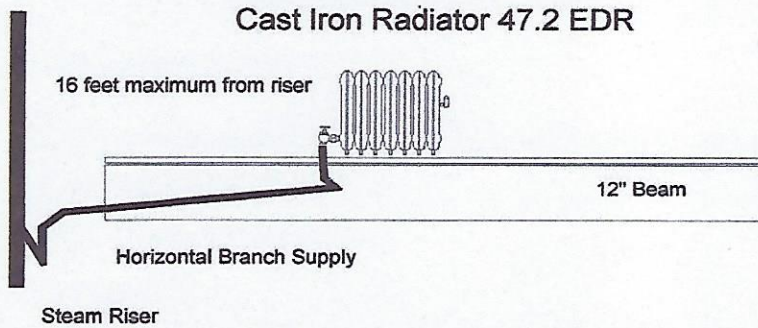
shows a cast-iron radiator installation with 1¼-inch pipe
